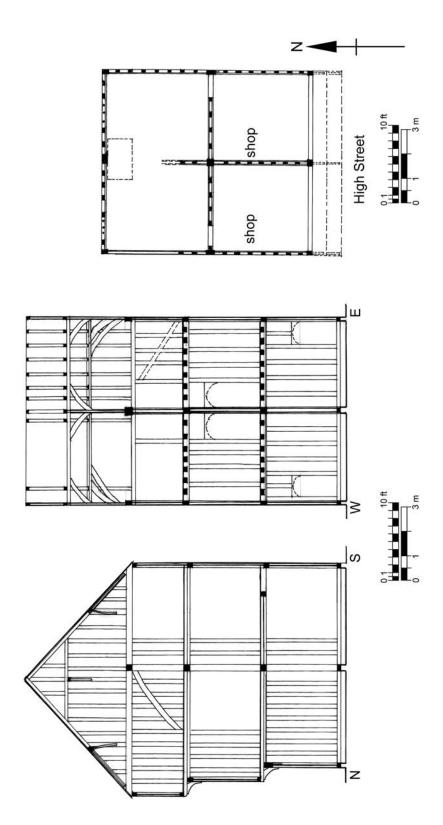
(centre) Front and (left) side elevations and (right) plan of 118 High Street (corpus no. 39)
